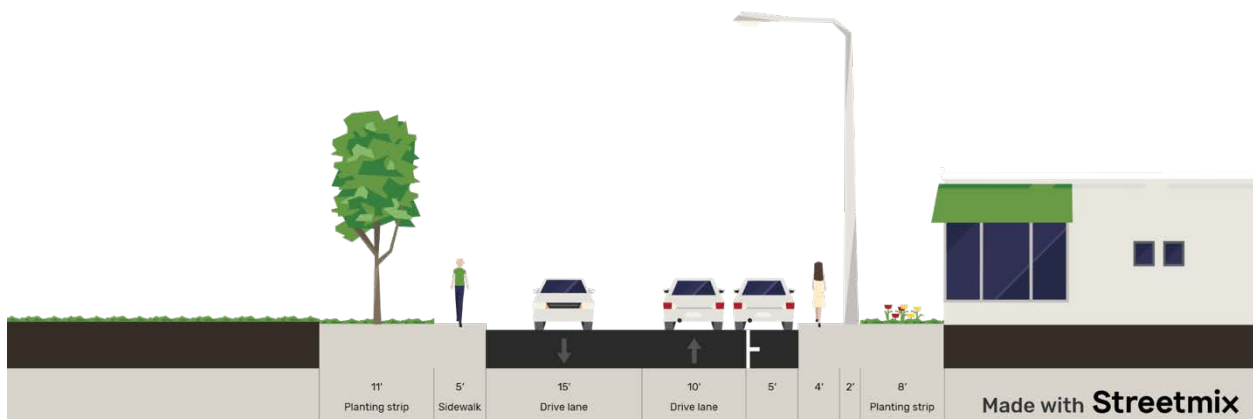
The cross-section of Carroll Street looking north. Note the narrow sidewalks on both sides of the street. On-street parking generally takes place on the east side of the street next to the houses. Diagram created in Streetmix by EC, 2022.
